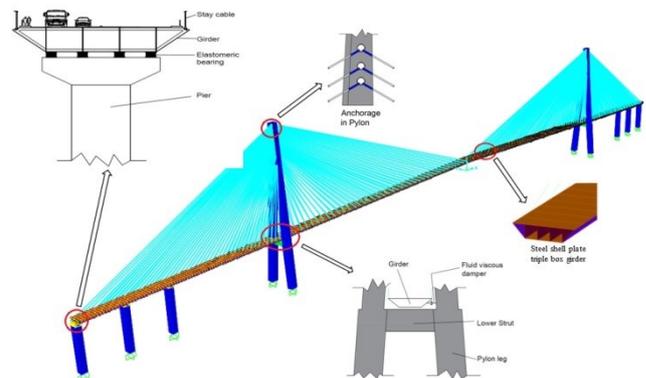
3-D finite element model of the bridge with A-shape pylon
